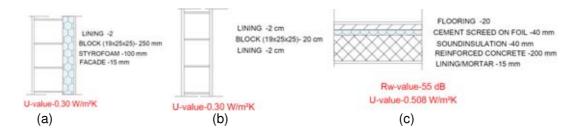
Outer (a), inner (b) wall and floor (c) composition of Building 1
